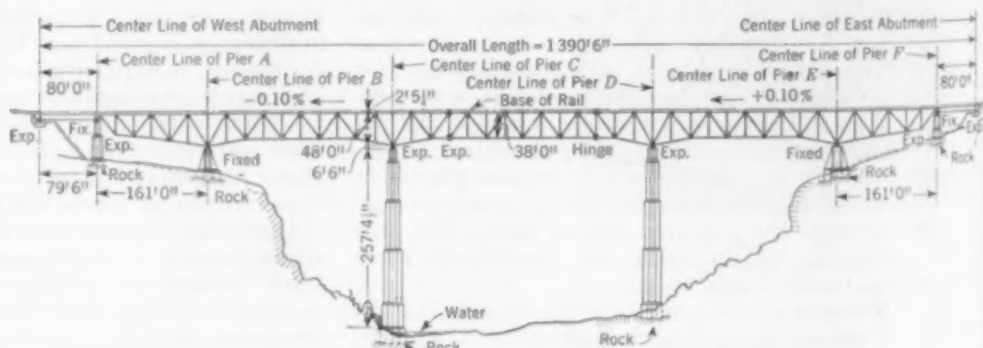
ELEVATION OF NEW PECOS RIVER BRIDGE
